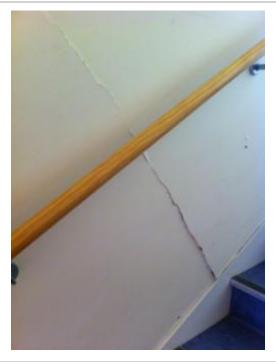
Severe Cracking to Wall Lining on the SouthWall (Bottom of Cracking)
